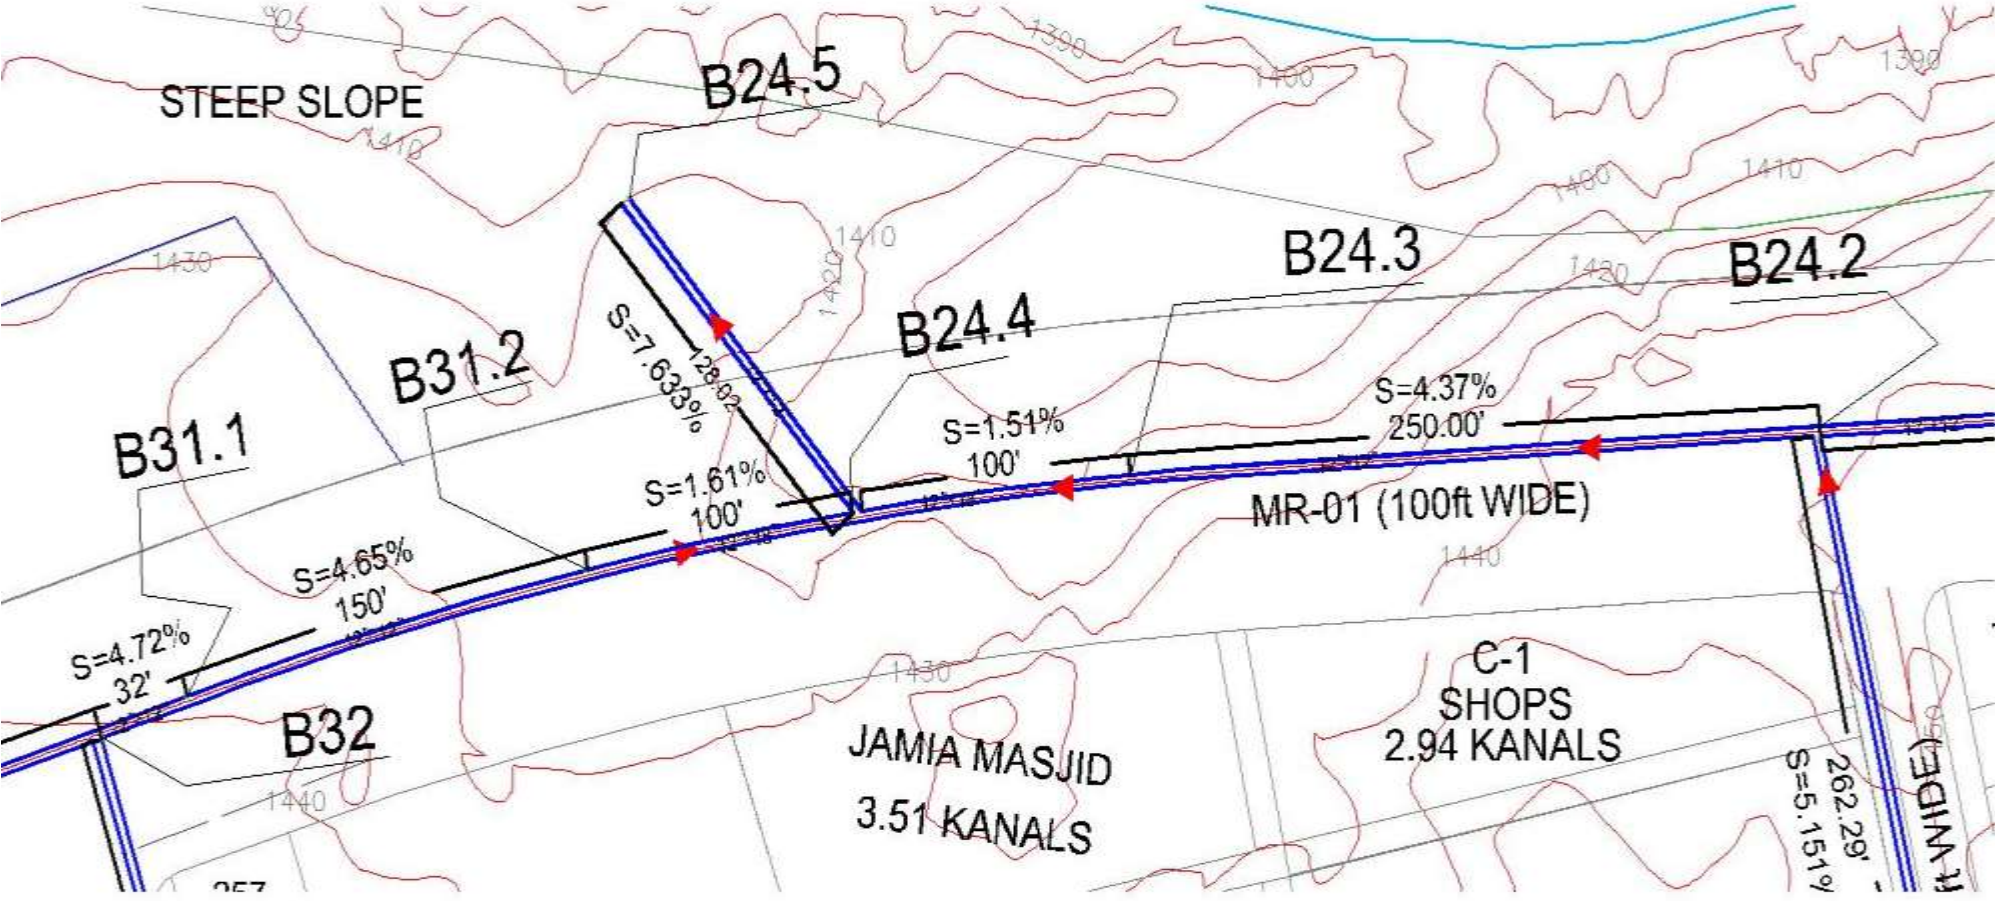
Storm drainage layout plan of Sub-catchment-3 showing final disposal node B24.5
